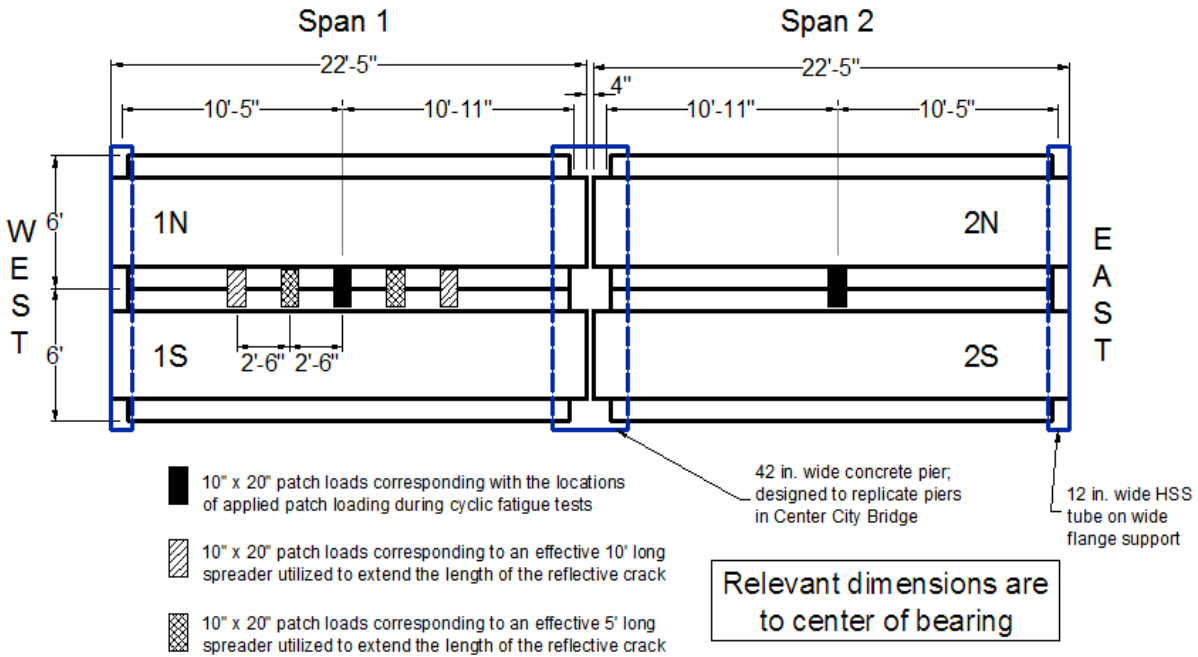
Placement of patch loads during fatigue loading and extension of longitudinal reflective cracking (applicable in Span 1 only) for the Concept 1 laboratory bridge specimen
